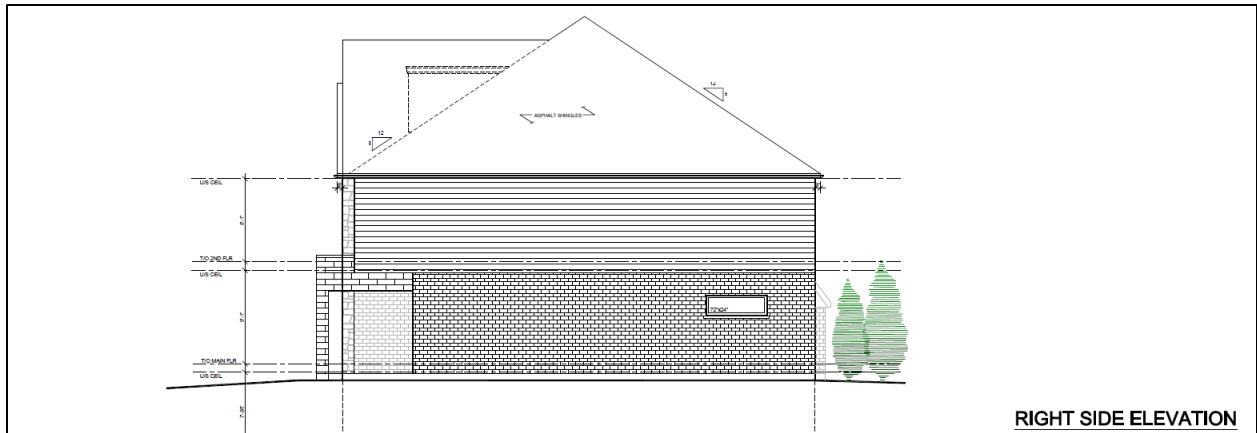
Right Side (East) Elevation of the Proposed End Townhouse Unit
